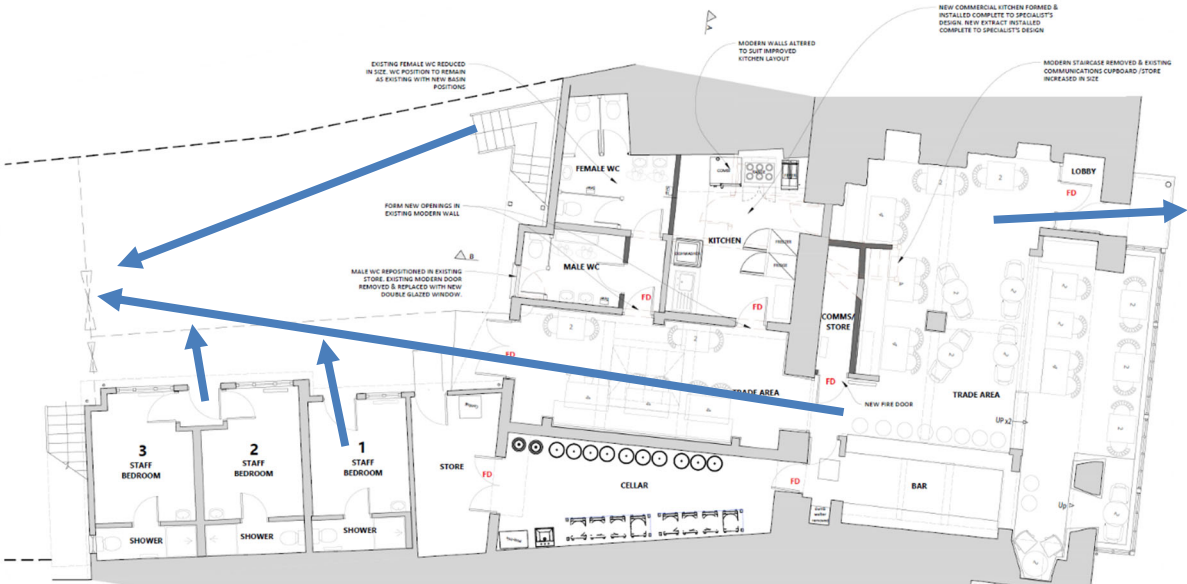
Proposed ground floor plan. - flood escape routes marked in blue, alternate route marked in green.
